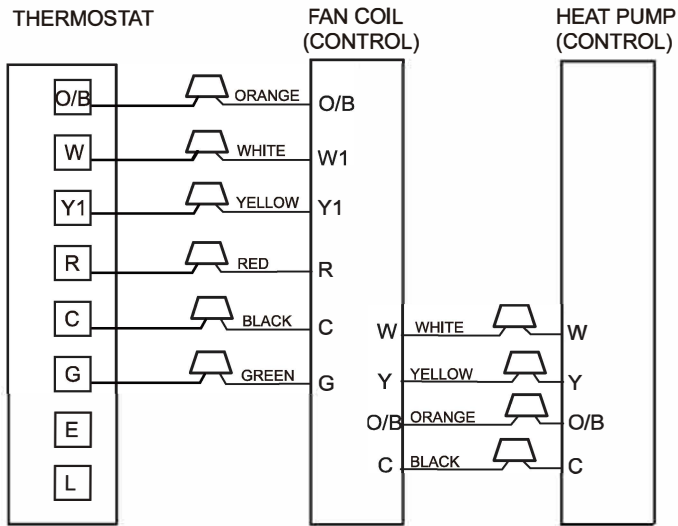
Wiring Layout Heat Pump Unit (Cooling and 2-Stage Heat)
